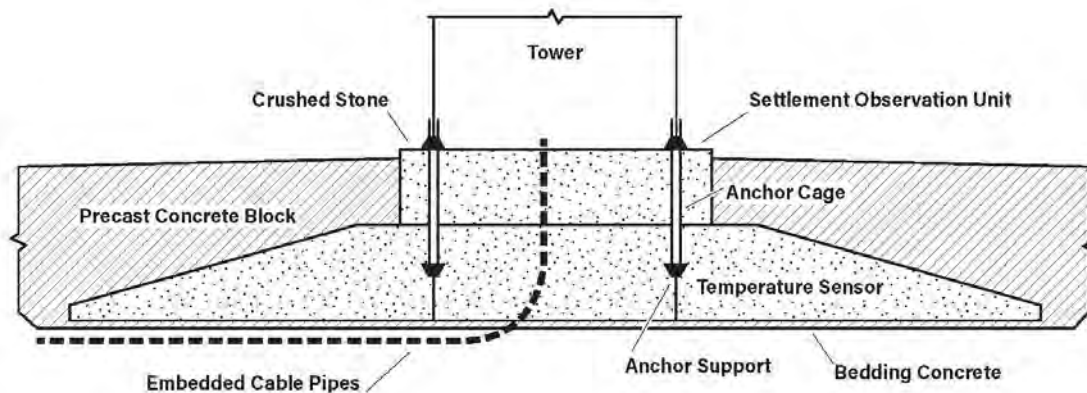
Sectional view of typical gravity-based spread footing foundation.
